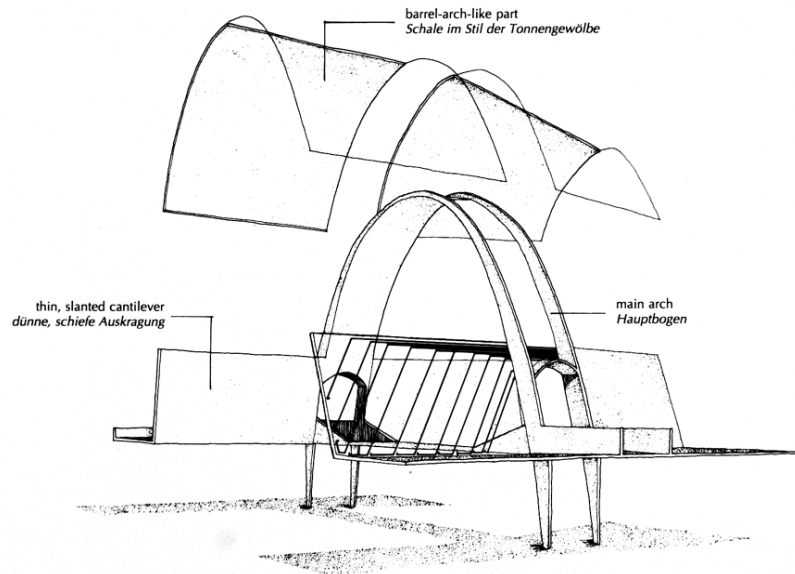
Cement Hall, early reinforced-concrete thin shell. Image shows arrangement of reinforcement in the shell. Robert Maillart, 1937, Zurich. (Billington)
